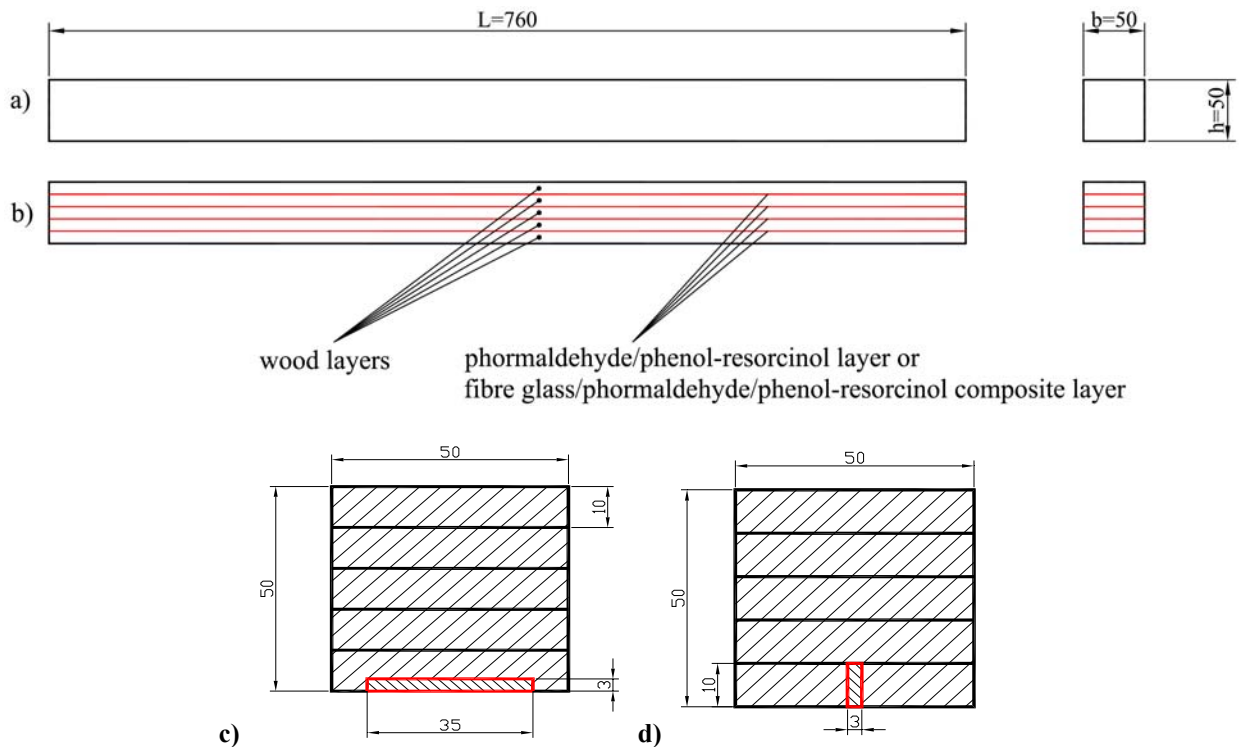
Beam-type specimen configurations: a) solid beams (MPP); b) laminated beams reinforced with fiber glass (LPPF1 and LPPF2); c) laminated beams reinforced with horizontal pultruded lamellas (LPPH); d) laminated beams reinforced with vertical pultruded lamellas (LPPV).
